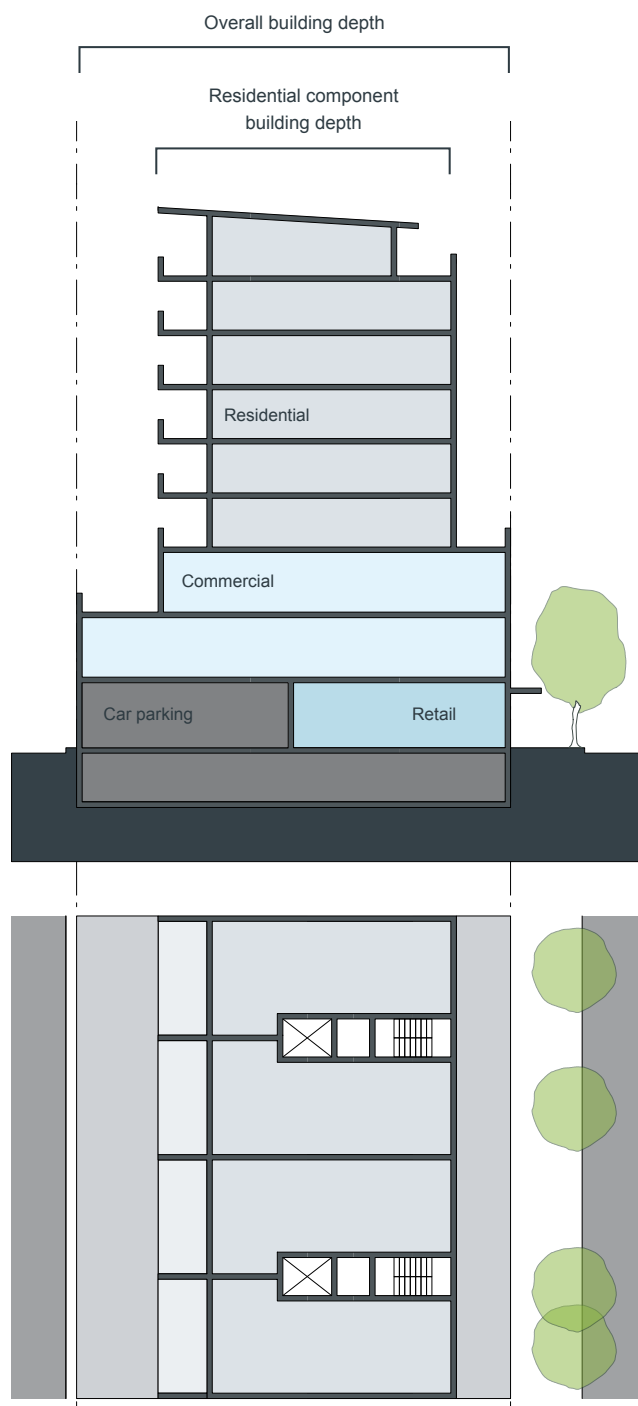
E.1 A mixed used building showing the transition of building depth: deeper floors on lower levels dedicated to retail/commercial use to narrower residential apartments on upper levels
